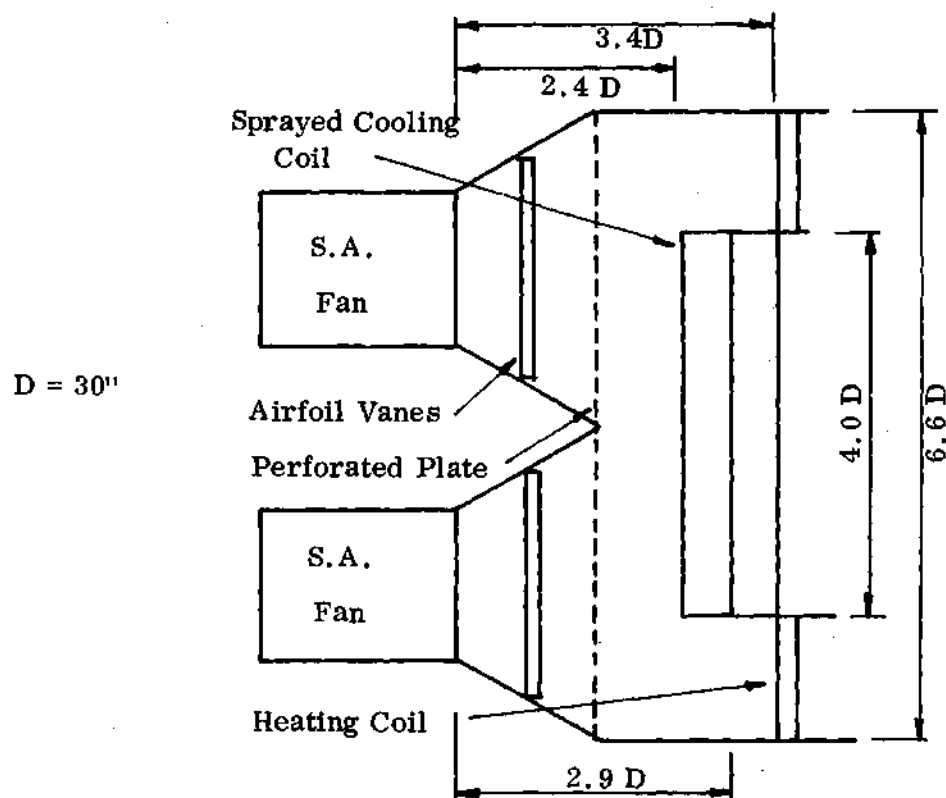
Small Symmetric Parallel Fan Room Arrangement.
